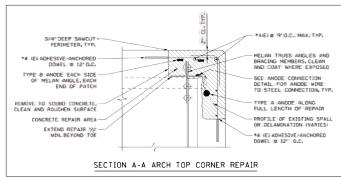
Typical detail for arch corner repair where concrete was unsound
